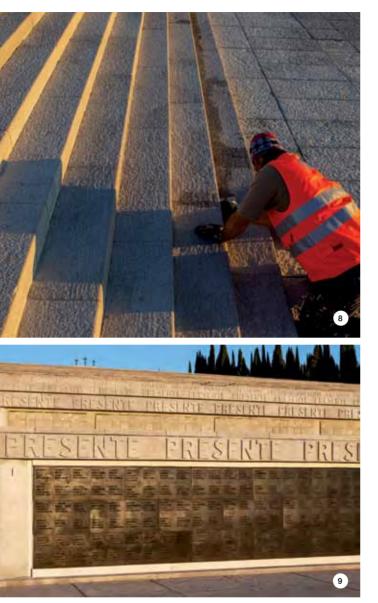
Skirting was bonded in place with KERAQUICK MAXI S1. PHOTO 9. The sealing plates for the crypts were rebuilt with PLANITOP SMOOTH & REPAIR and sealed with MAPEFLEX PU 45.
